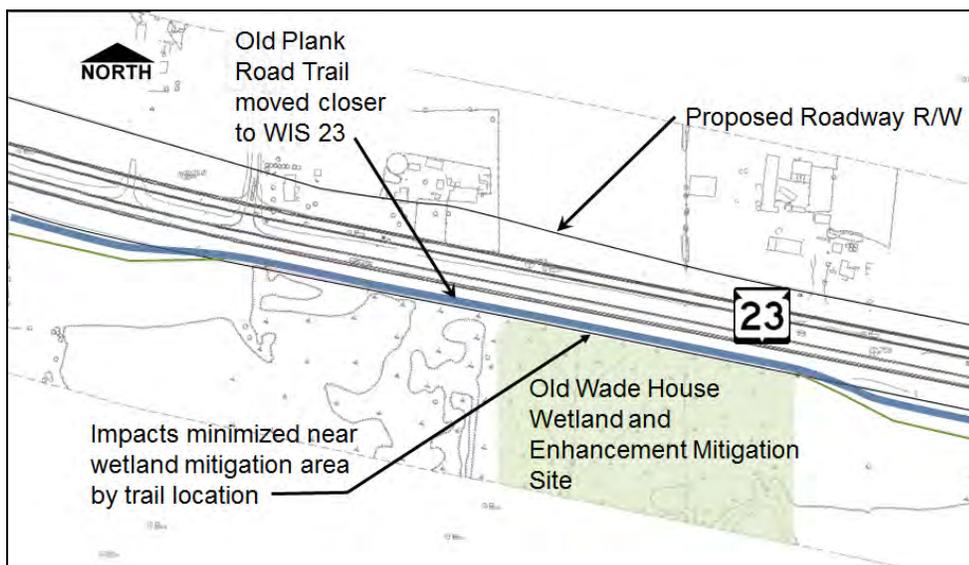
C-1.19 Old Plank Road Trail and Old Wade House Wetland Mitigation Site
